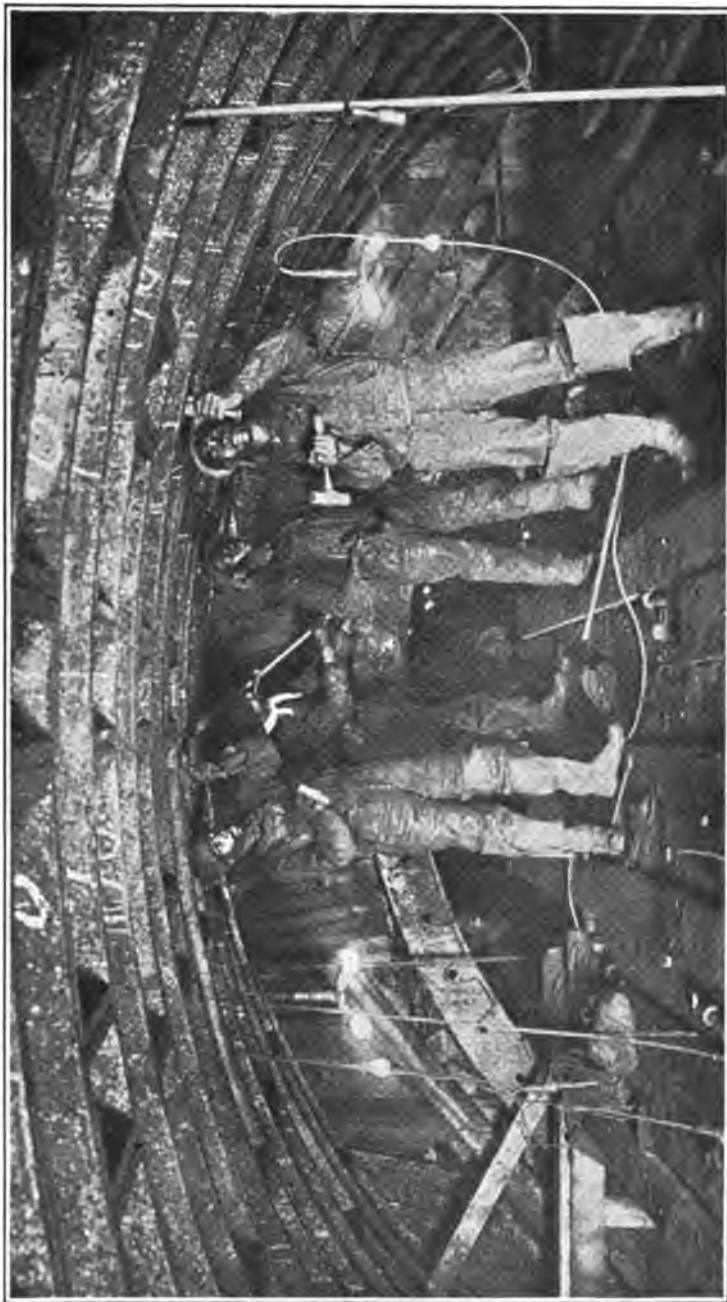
Calking and grummeting in the roof of an iron-lined tunnel. Pennsylvania Railroad Hudson River Tunnels, New York (A-18). (Courtesy of *Pennsylvania Railroad*.)
